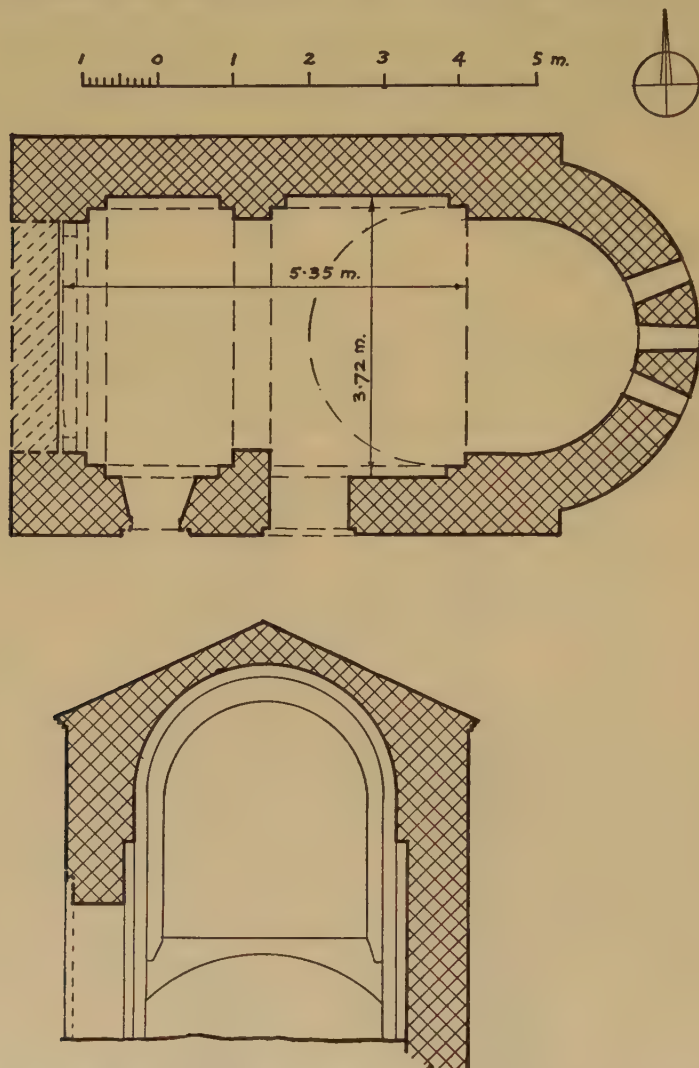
Plan, and section looking west, of church at Orta Mahalle, Akçaabat.
